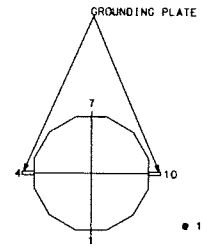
DETAIL B - STAINLESS STEEL GROUNDING PLATE - OPGW AND BASE OF POLE (4 HOLE NEMA PAD)
